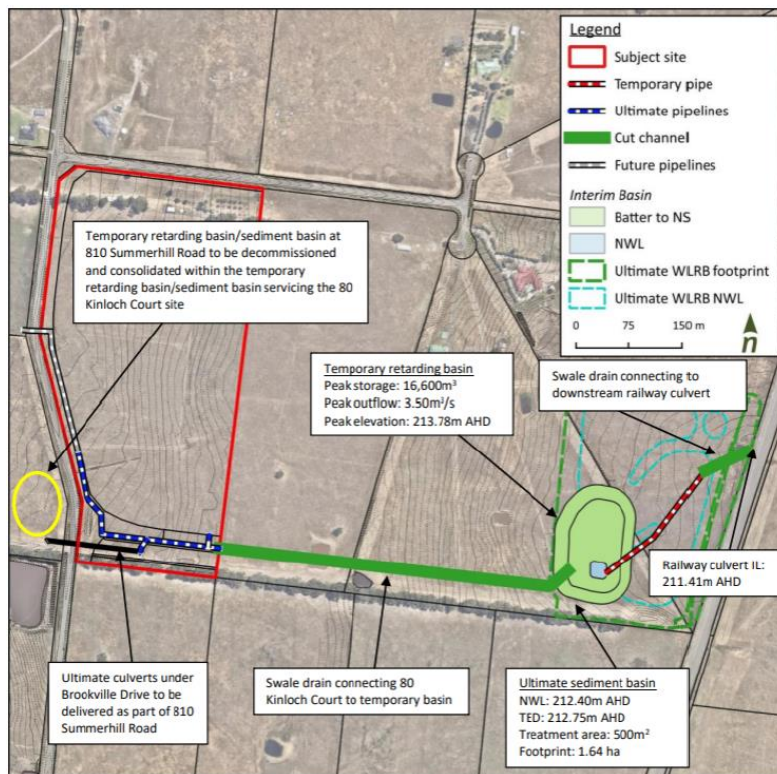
Proposed temporary site drainage layout with retarding basin (Source: Stormwater Management Strategy)
